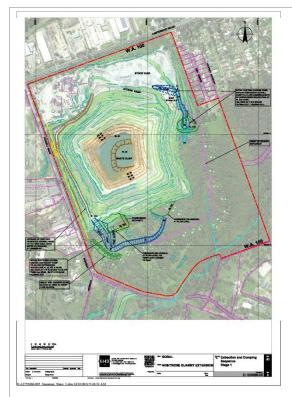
Proposed Expanded Pit – Stage 1 (source GHD)
